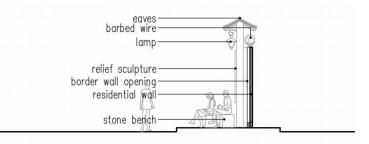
Section of The Blocked Wall 1:150 (Source: Drawn by the Author)
